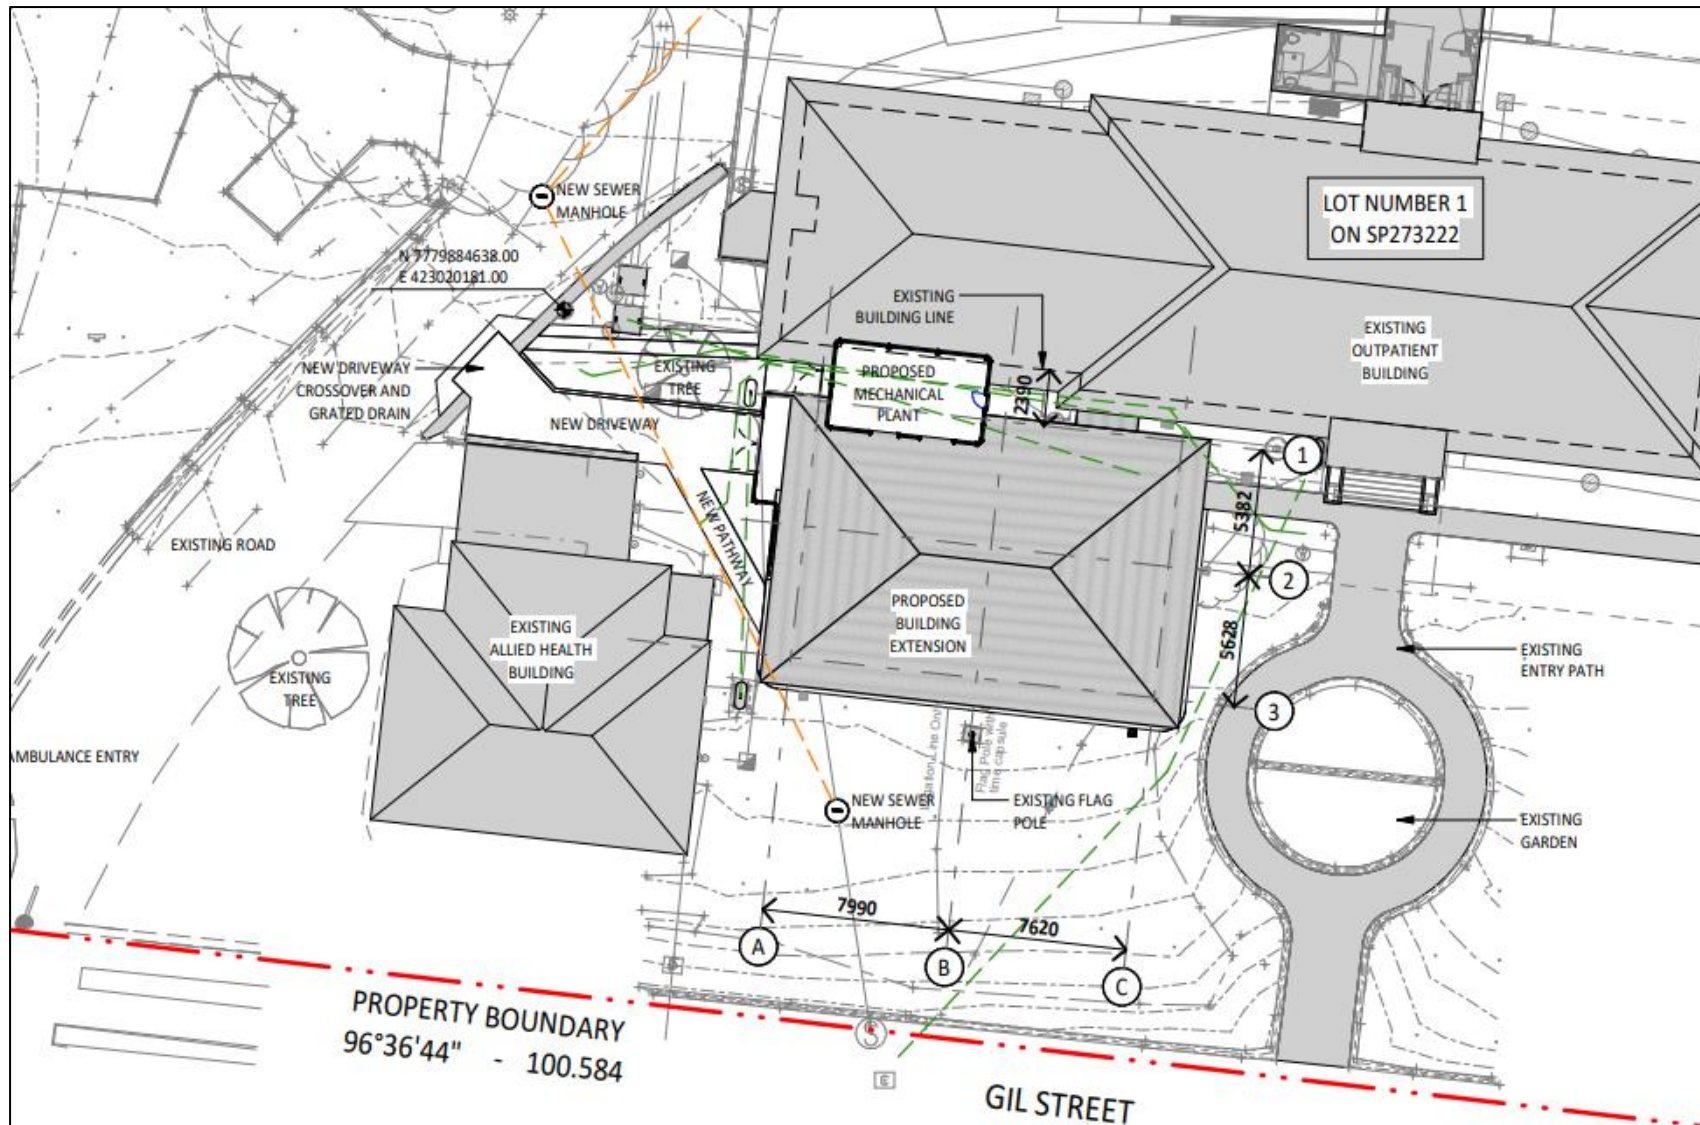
Plans for proposed new CT Scanner Building (Peddle Thorp 2025).
